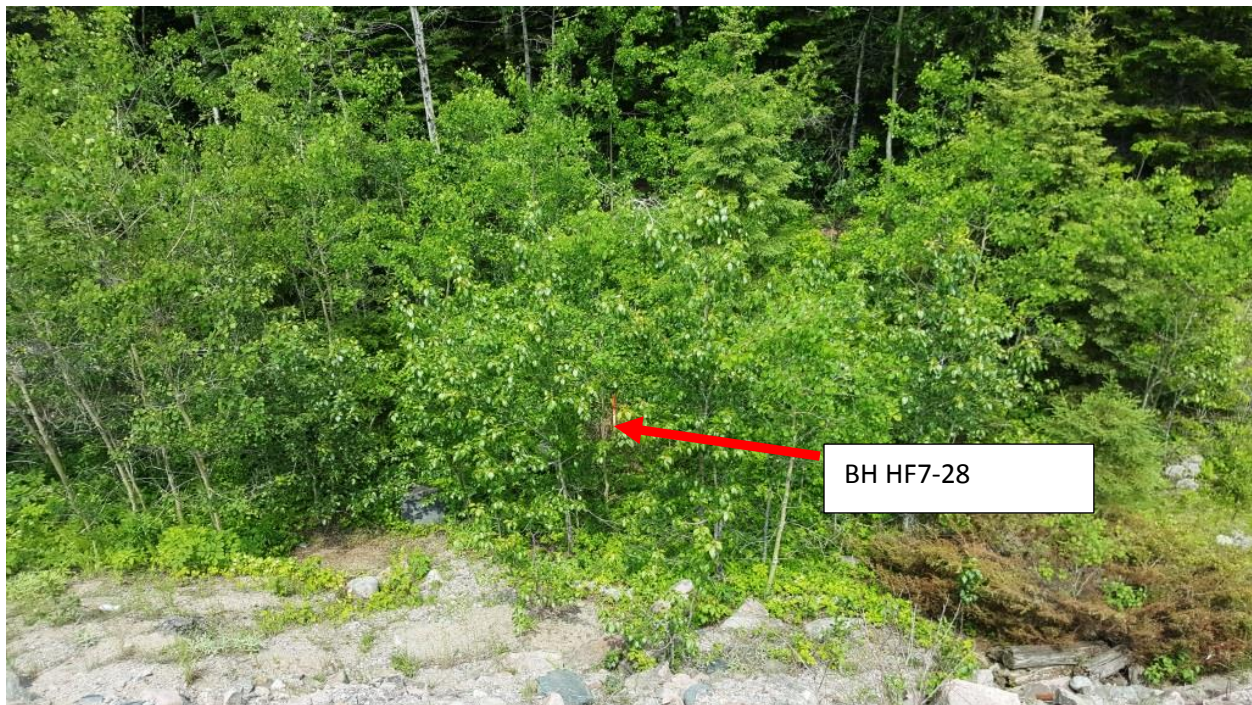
Looking toward north – BH HF7-28 (June 2017)
